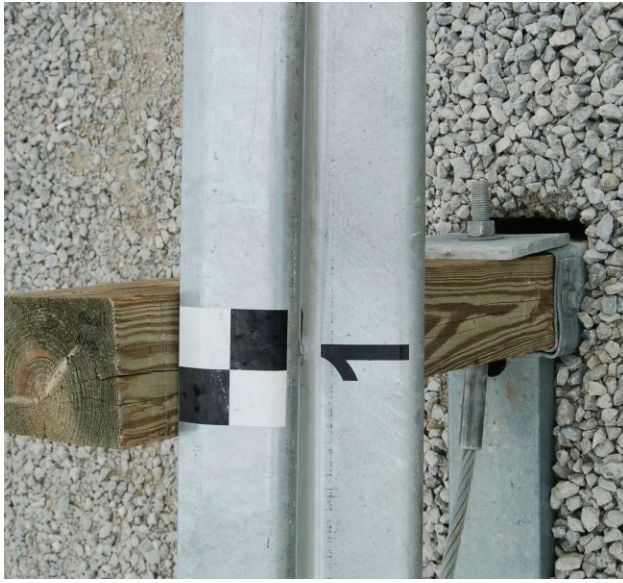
Upstream Anchorage Damage, Test No. MWTSF-2
